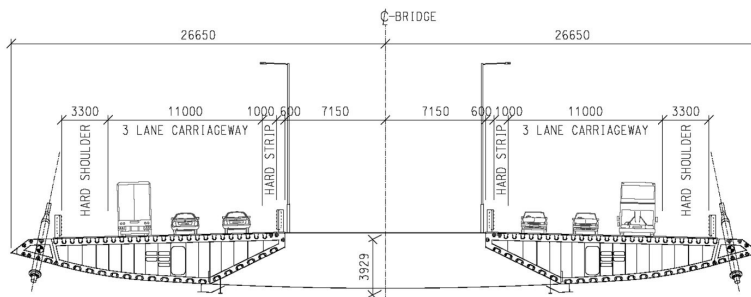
Stonecutters cross section. (Hui and Wong, 2009)
